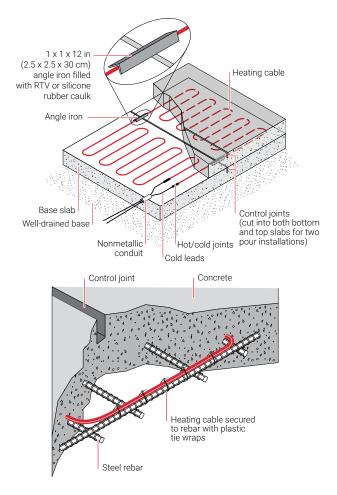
Method of crossing crack-control joints with MI heating cable in concrete slabs
